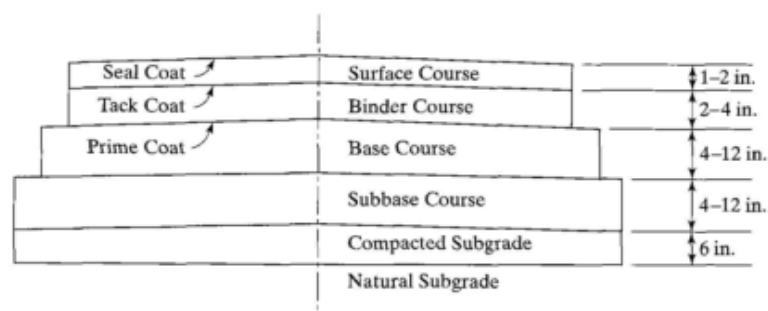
Typical Cross-section of a Conventional Flexible Pavement
